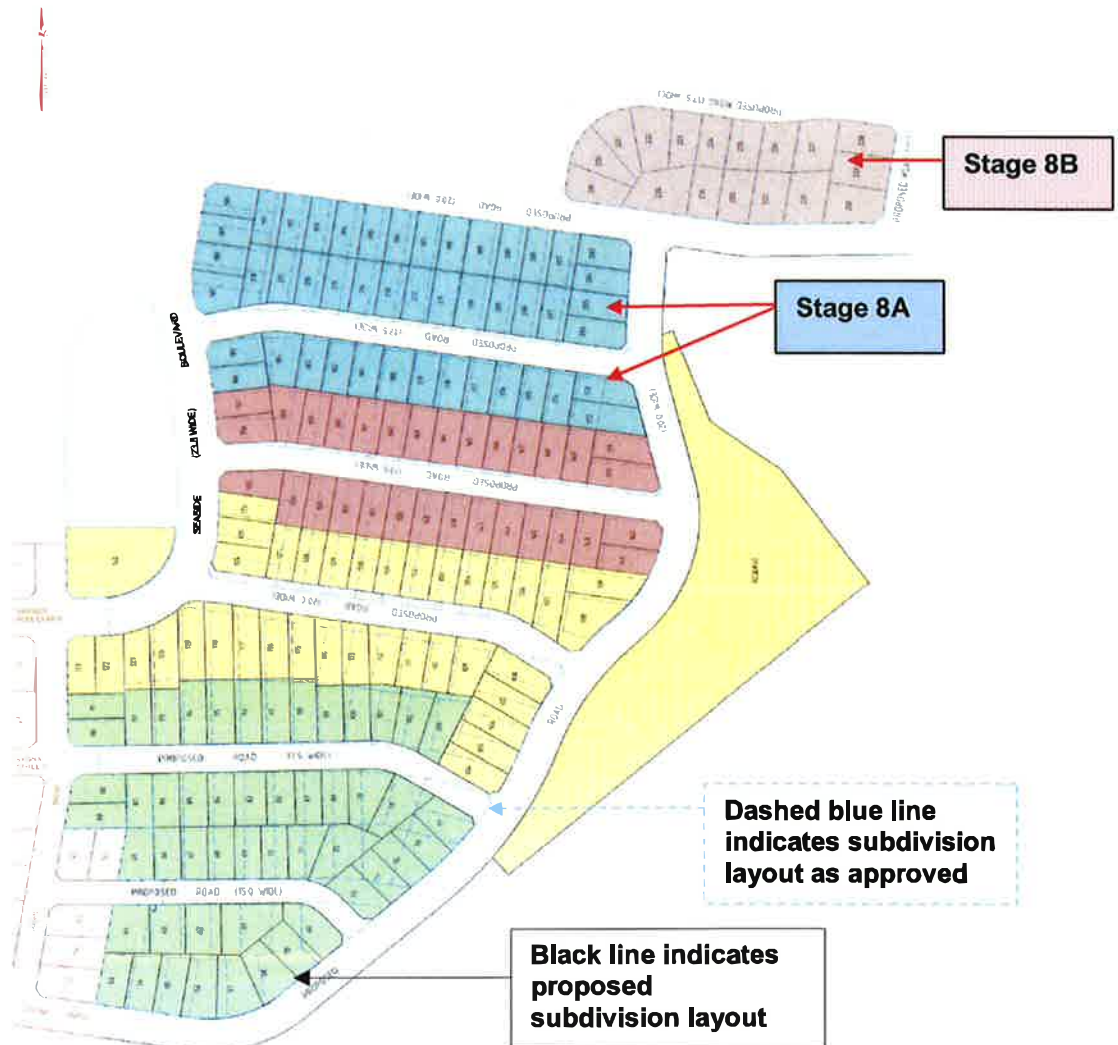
Proposed Staging and Subdivision Layout – Overlaid with Approved Subdivision Layout
